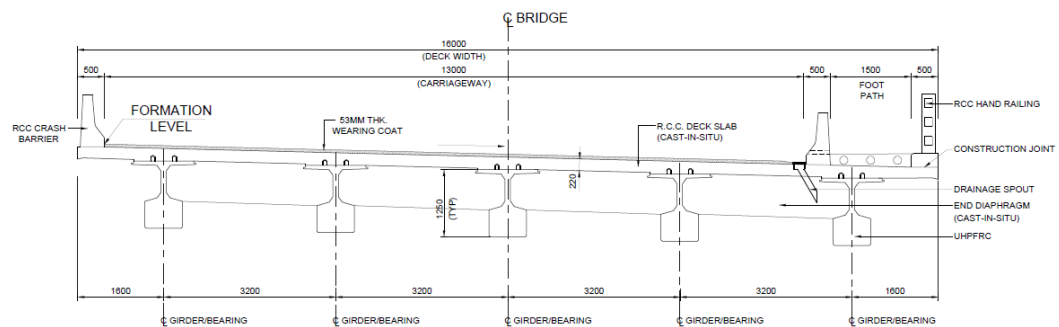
26 Cross section of 30m span UHPFRC post tensioned I girder at support
